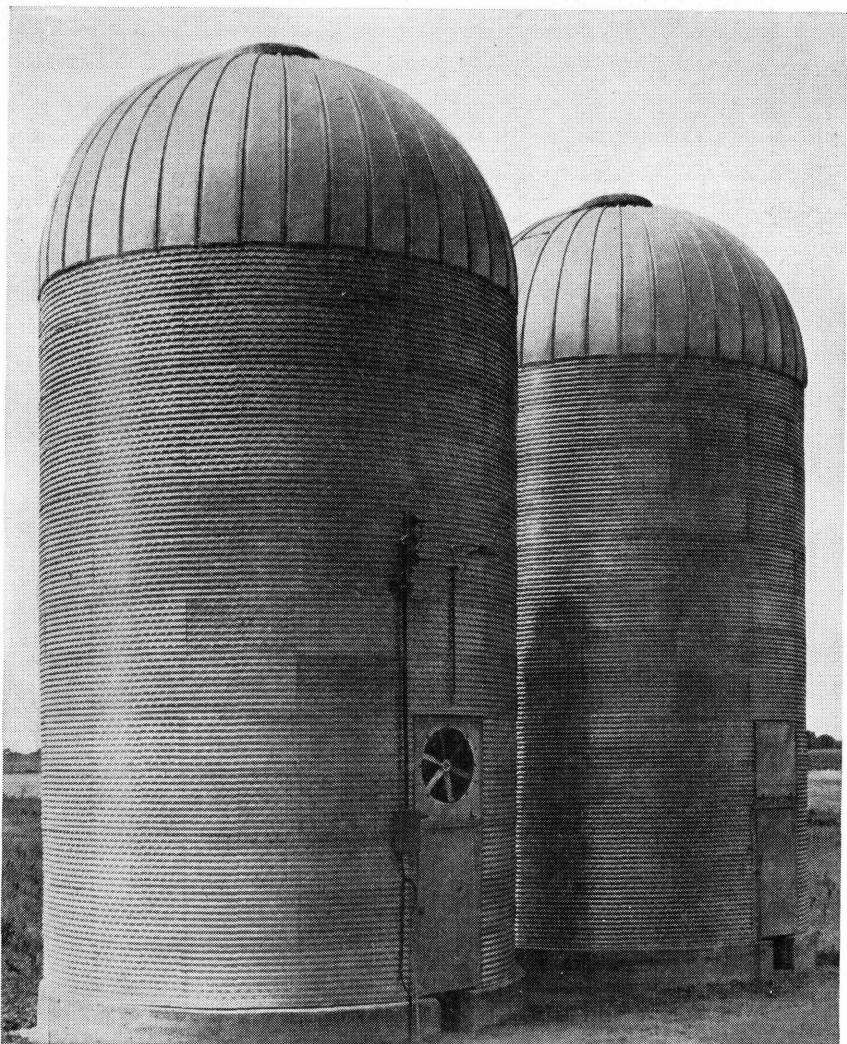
These prefabricated round cribs are provided with perforated walls and central air ducts for forced ventilation.
